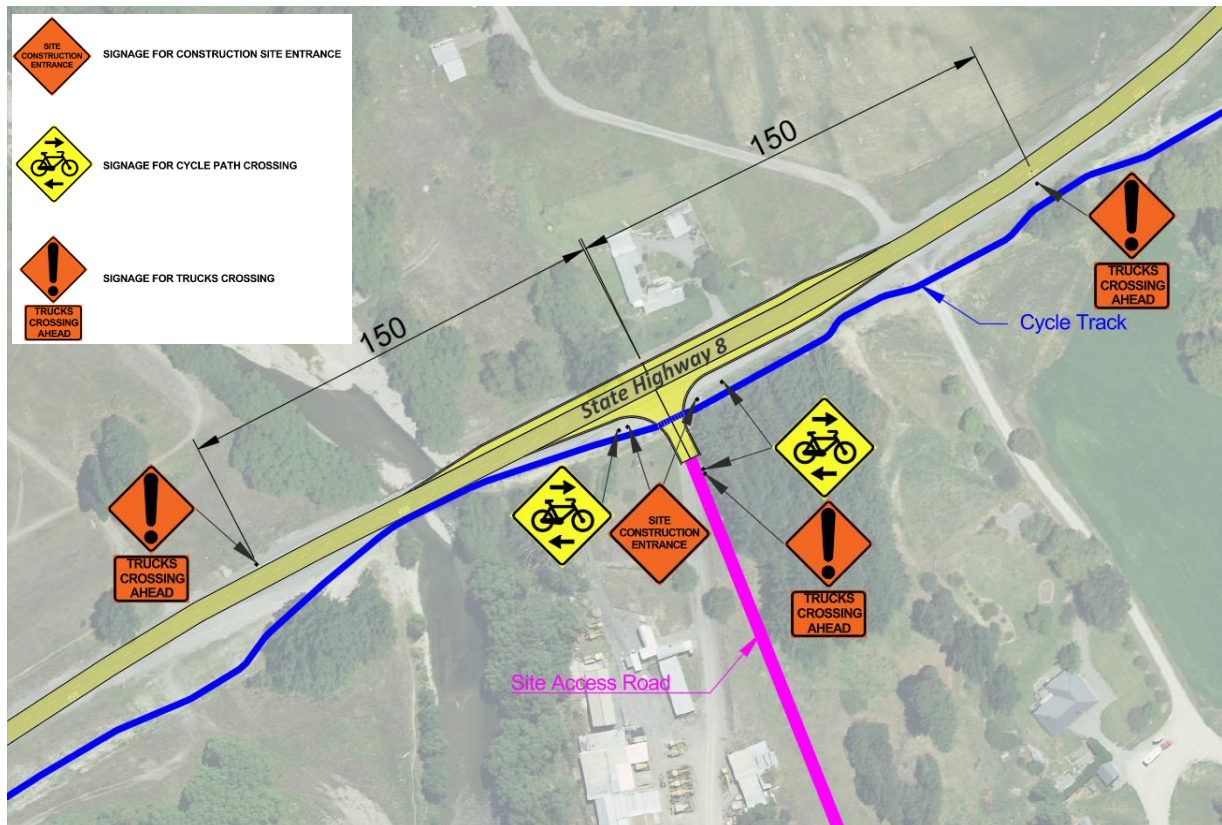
Preliminary Signage Layout: FNSF Construction Site Access and A2O Cycle Track Crossing
